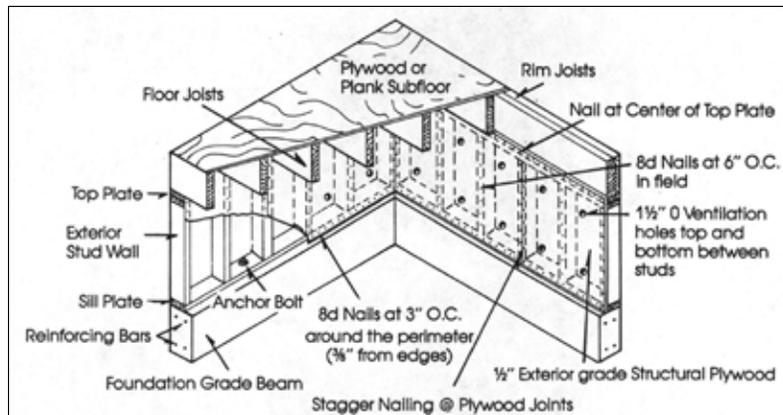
Cripple wall retrofit and foundation anchorage (WHE Report 90)
